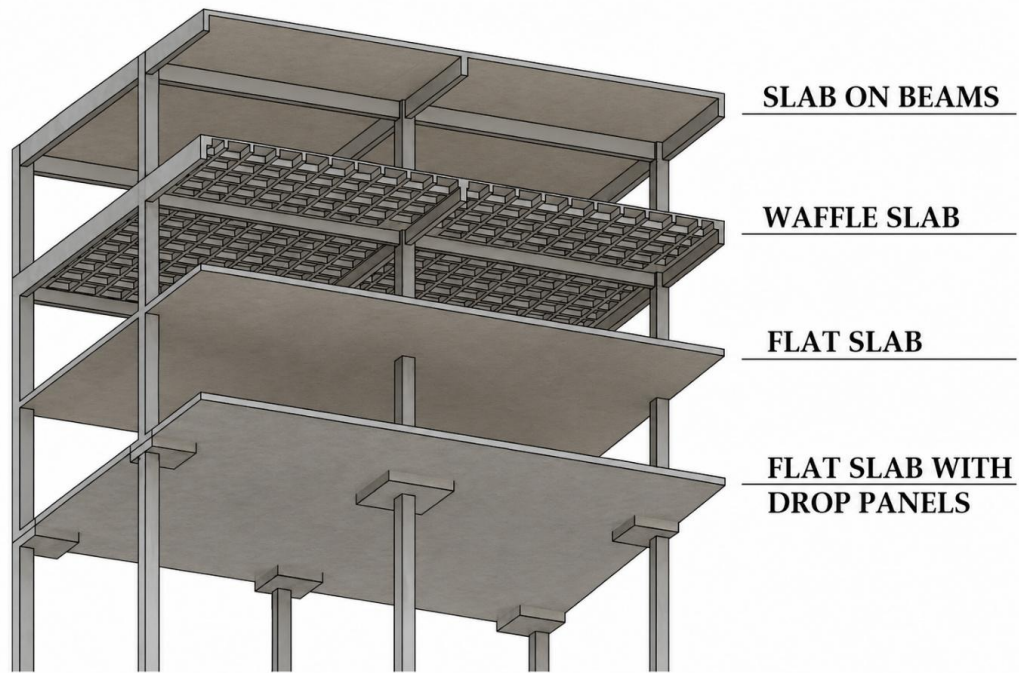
Exploded view of the reinforced concrete floor systems considered at Level 1: slab on beams (beam-and-slab), two-way joist, flat slab, and flat slab with drop panels.
